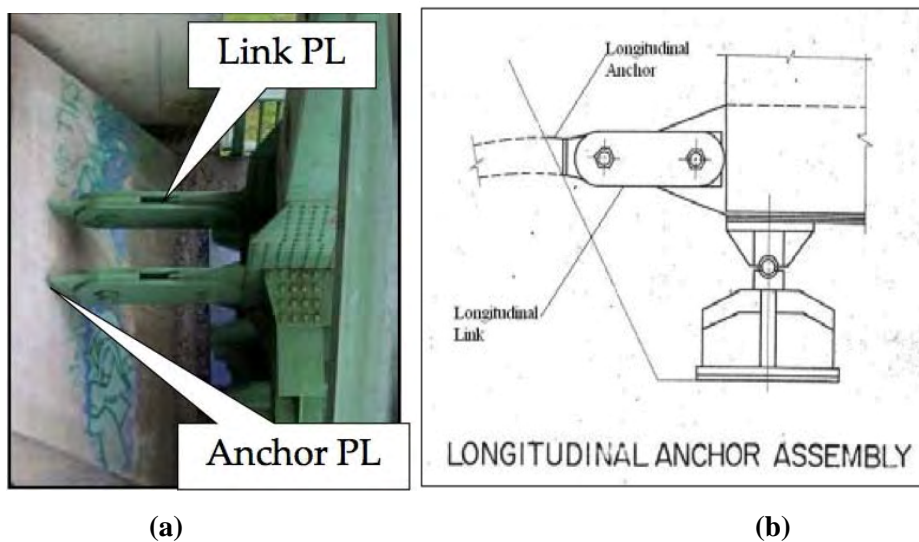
Longitudinal anchors assembly to the abutment (Reno and Pohll, 2010a)
